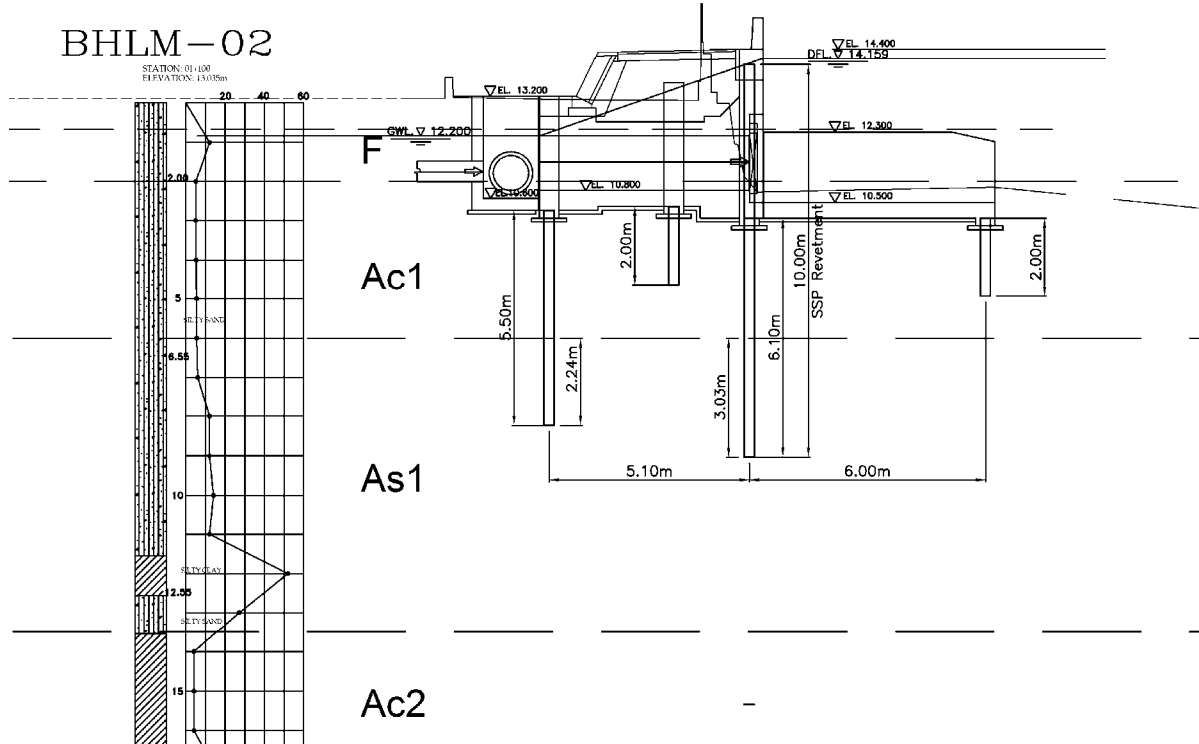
Length of SSP Cut off Wall (1/9) (MSL-1)
